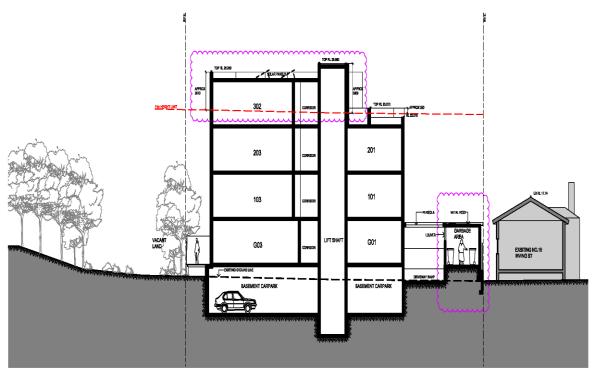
Extract of Section 4 showing exceedance in building height. (Amended Plans)
